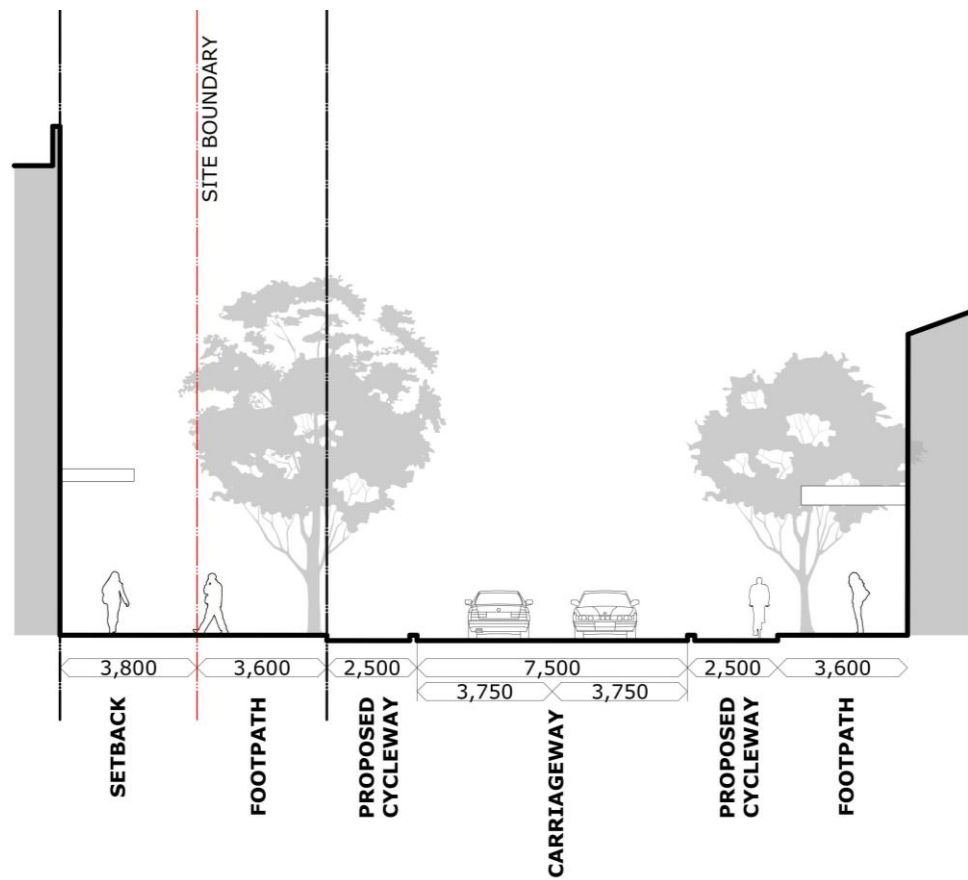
Section E - E – Local Street Typical Section – Wellington Street
